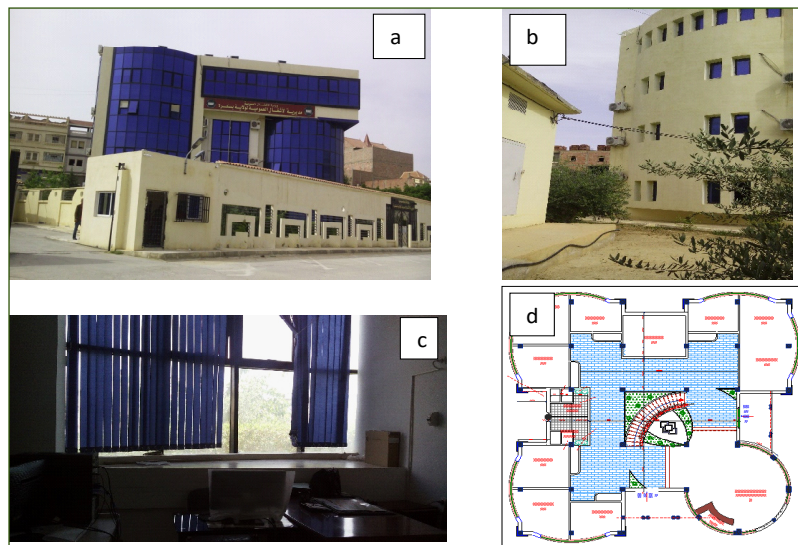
Public Works Department – Biskra –a: principal facade; b: north facade; c: view of interior office; d: building ground floor plan
